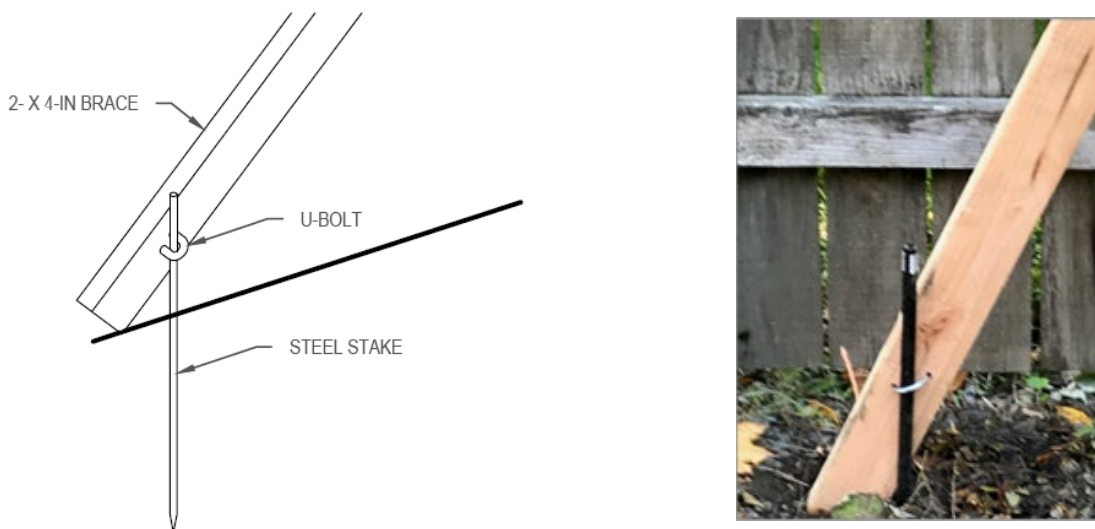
Required Steel Stake with Brace and U-Bolt (STD-D-6134)
